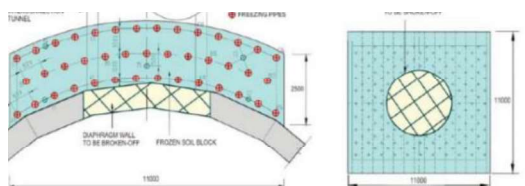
Frozen soil block plan (left) and elevation (right) (after Tsang et al. 2012)
